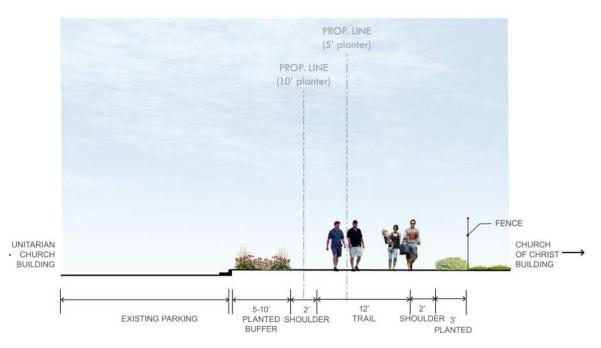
Option 3 - Full Build-Out North Typical Section
